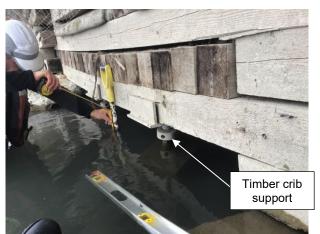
Measuring sediment depth in fish shelters and timber crib wall supports (September 25, 2020)
